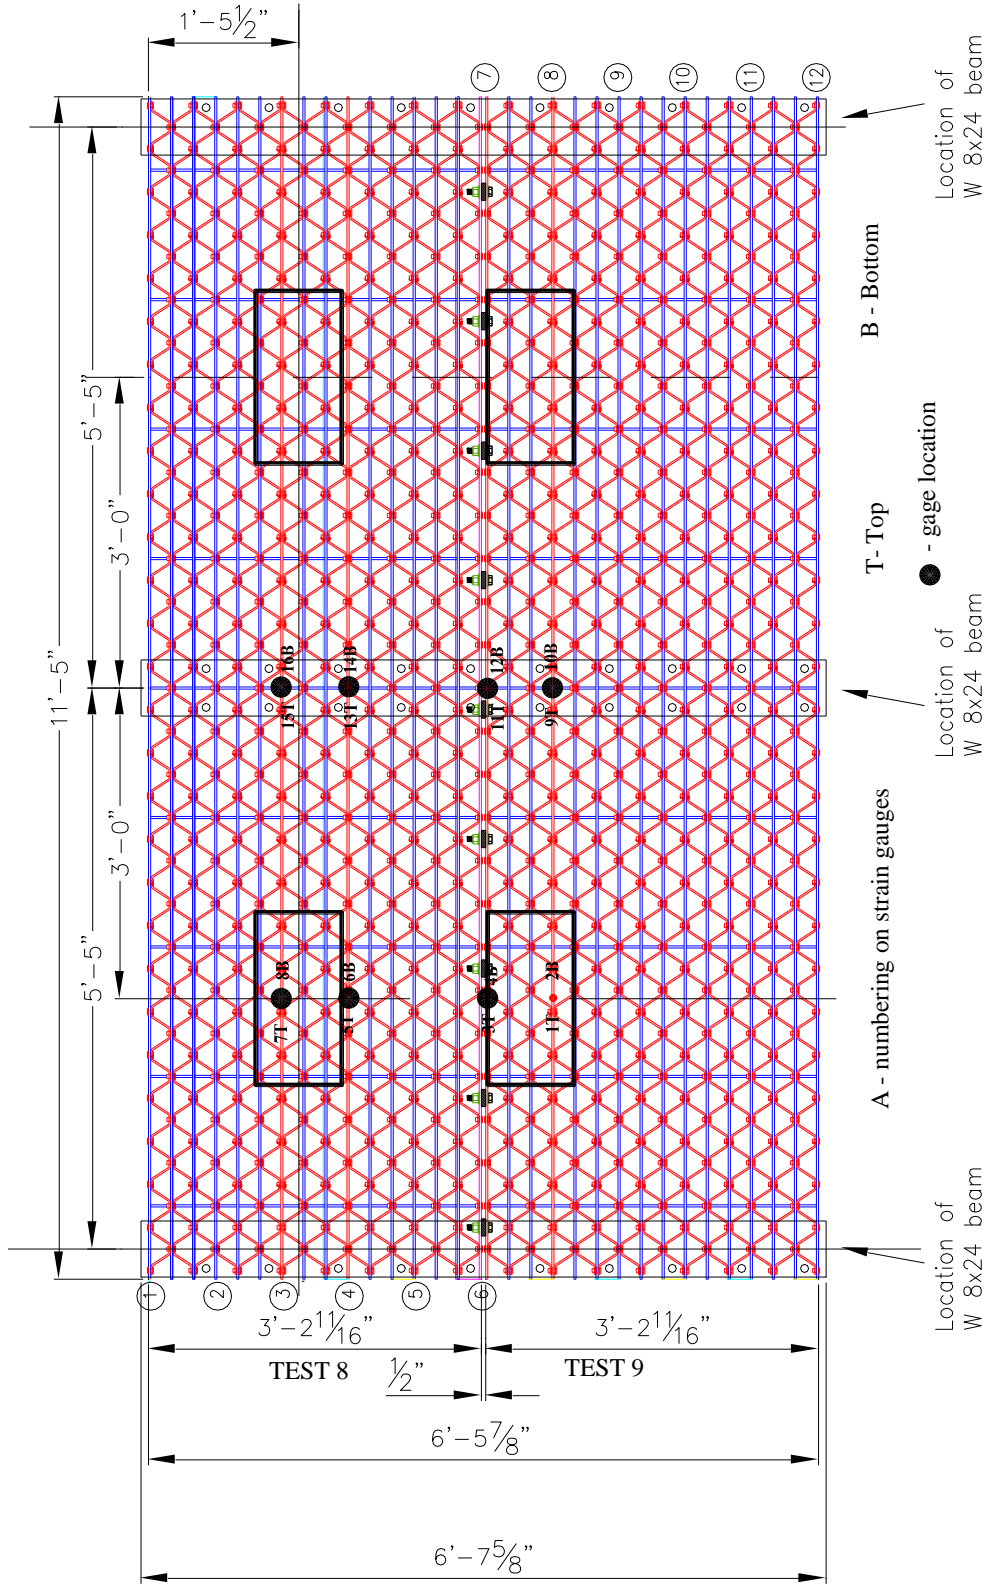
Layout of 37R5-L series showing loading and strain gage positions for test #8 and #9
